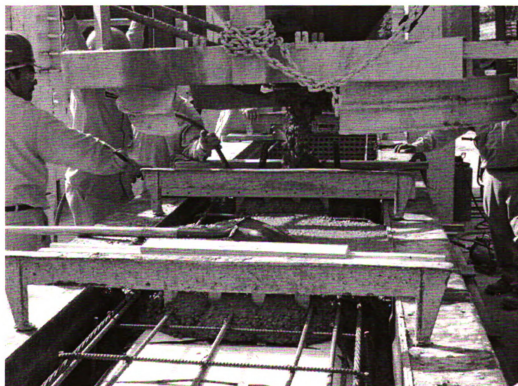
Casting Top Flange and Side Walls In NCC Beam
